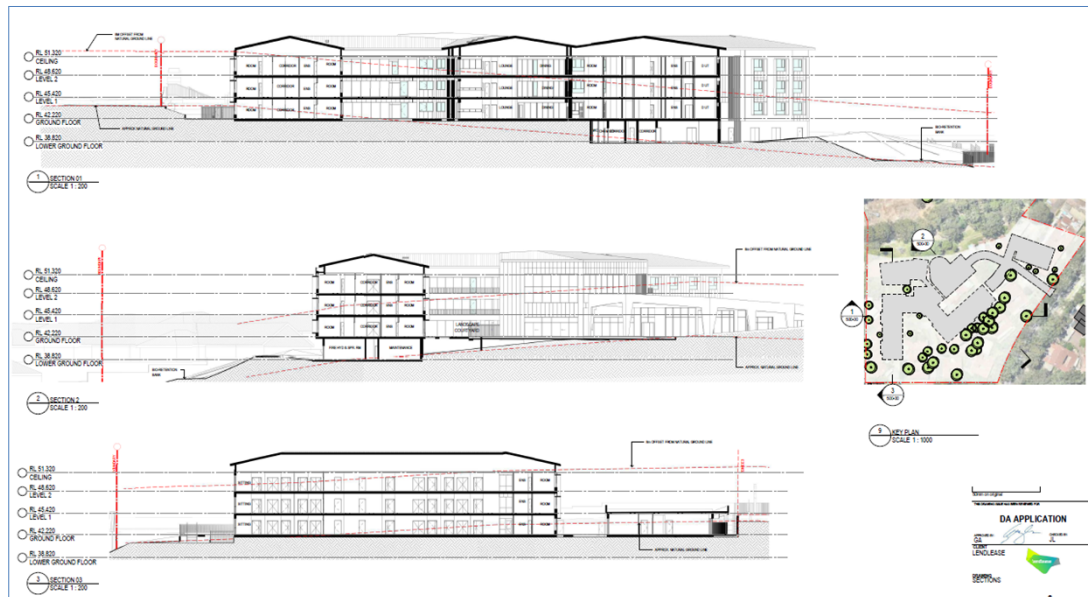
Sectional Elevations with the natural ground levels and 8m height plan shown as red dotted lines
